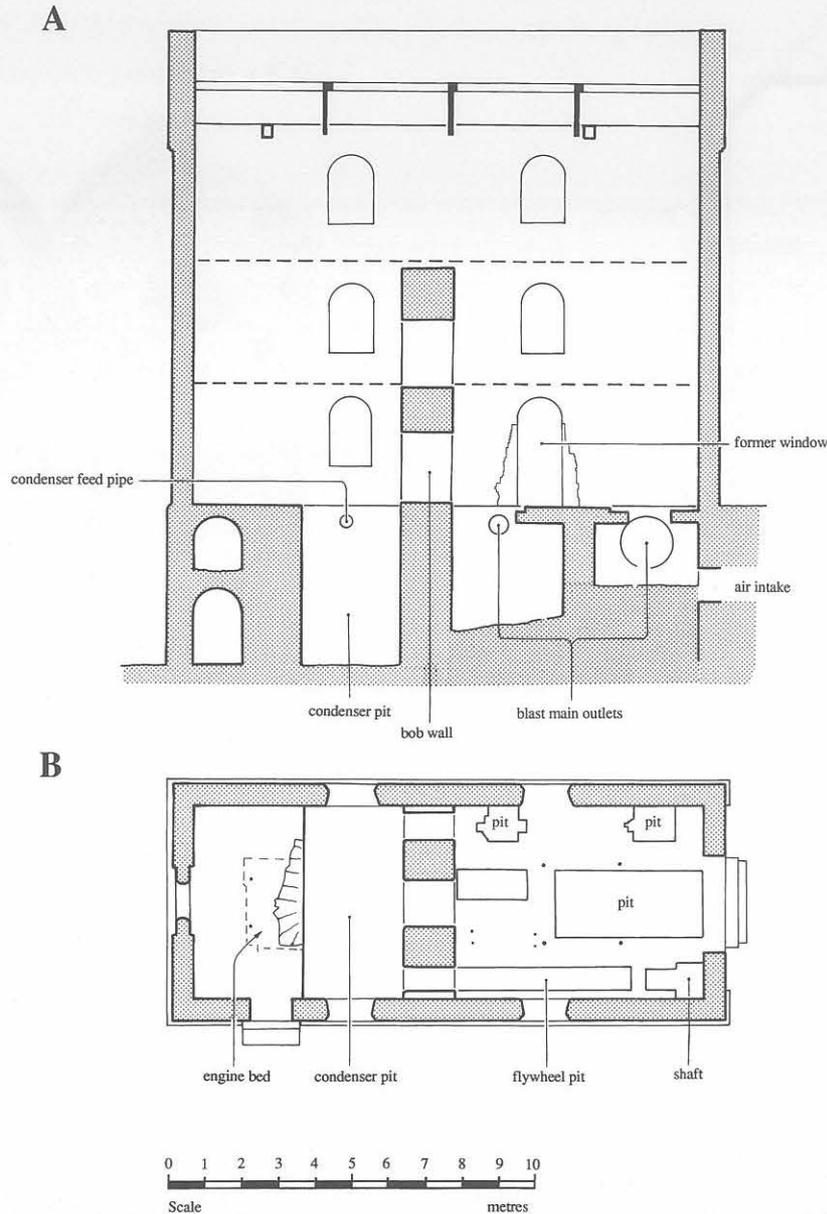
Internal east elevation (A) and plan (B) of the south engine house. The elevation shows, on the north side of the bob wall the engine bed and condenser pit with condenser feed pipe. On the south side of the bob wall are two blast main outlets, denoting two blowing cylinders. The plan shows the engine bed and condenser pit, and the flywheel pit and the central pit that housed the air intake pipe.
